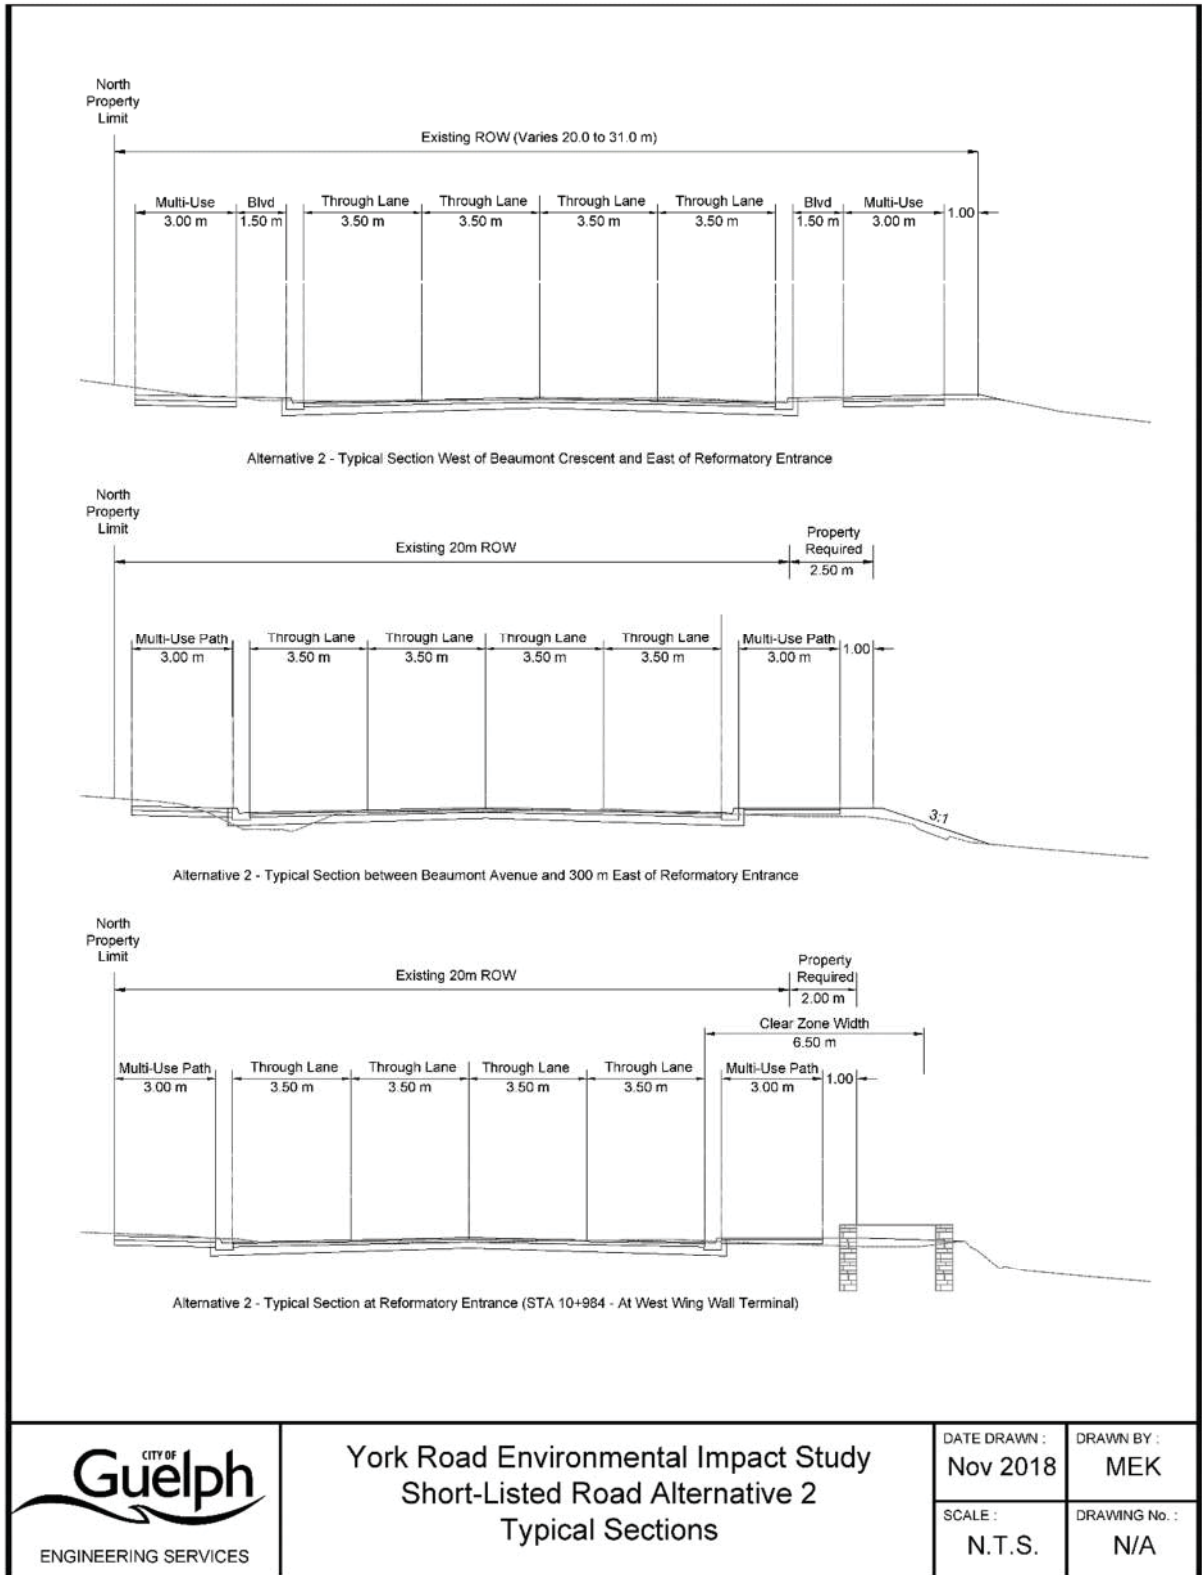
Typical Cross-Section for York Road Alternative 2.
